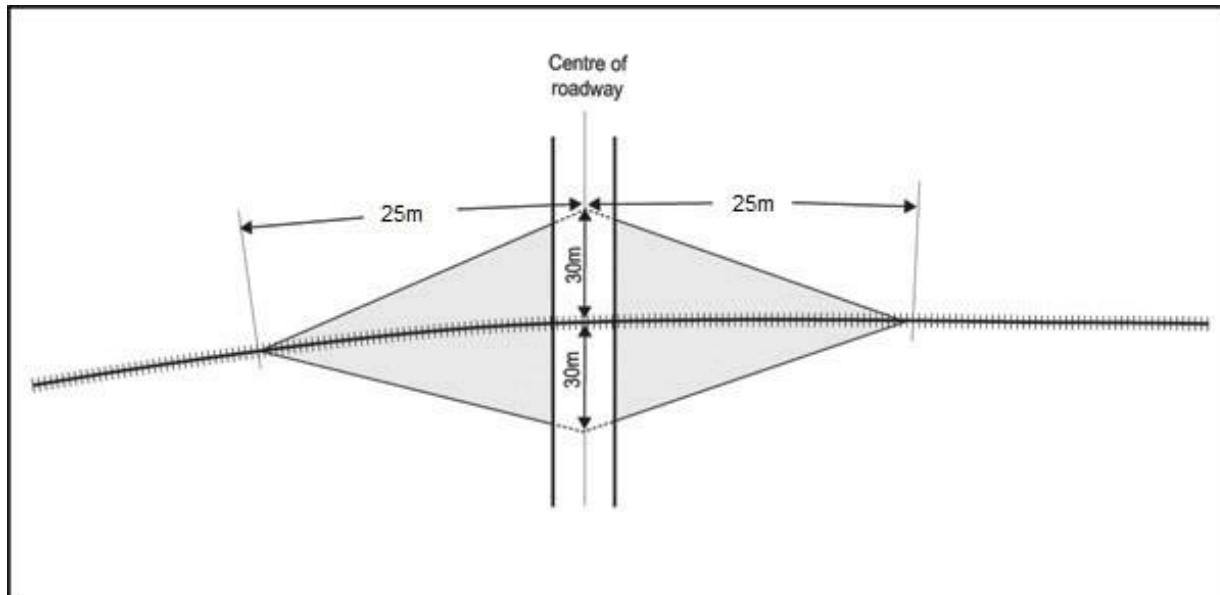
Approach sight triangles for public road/rail siding level crossings
